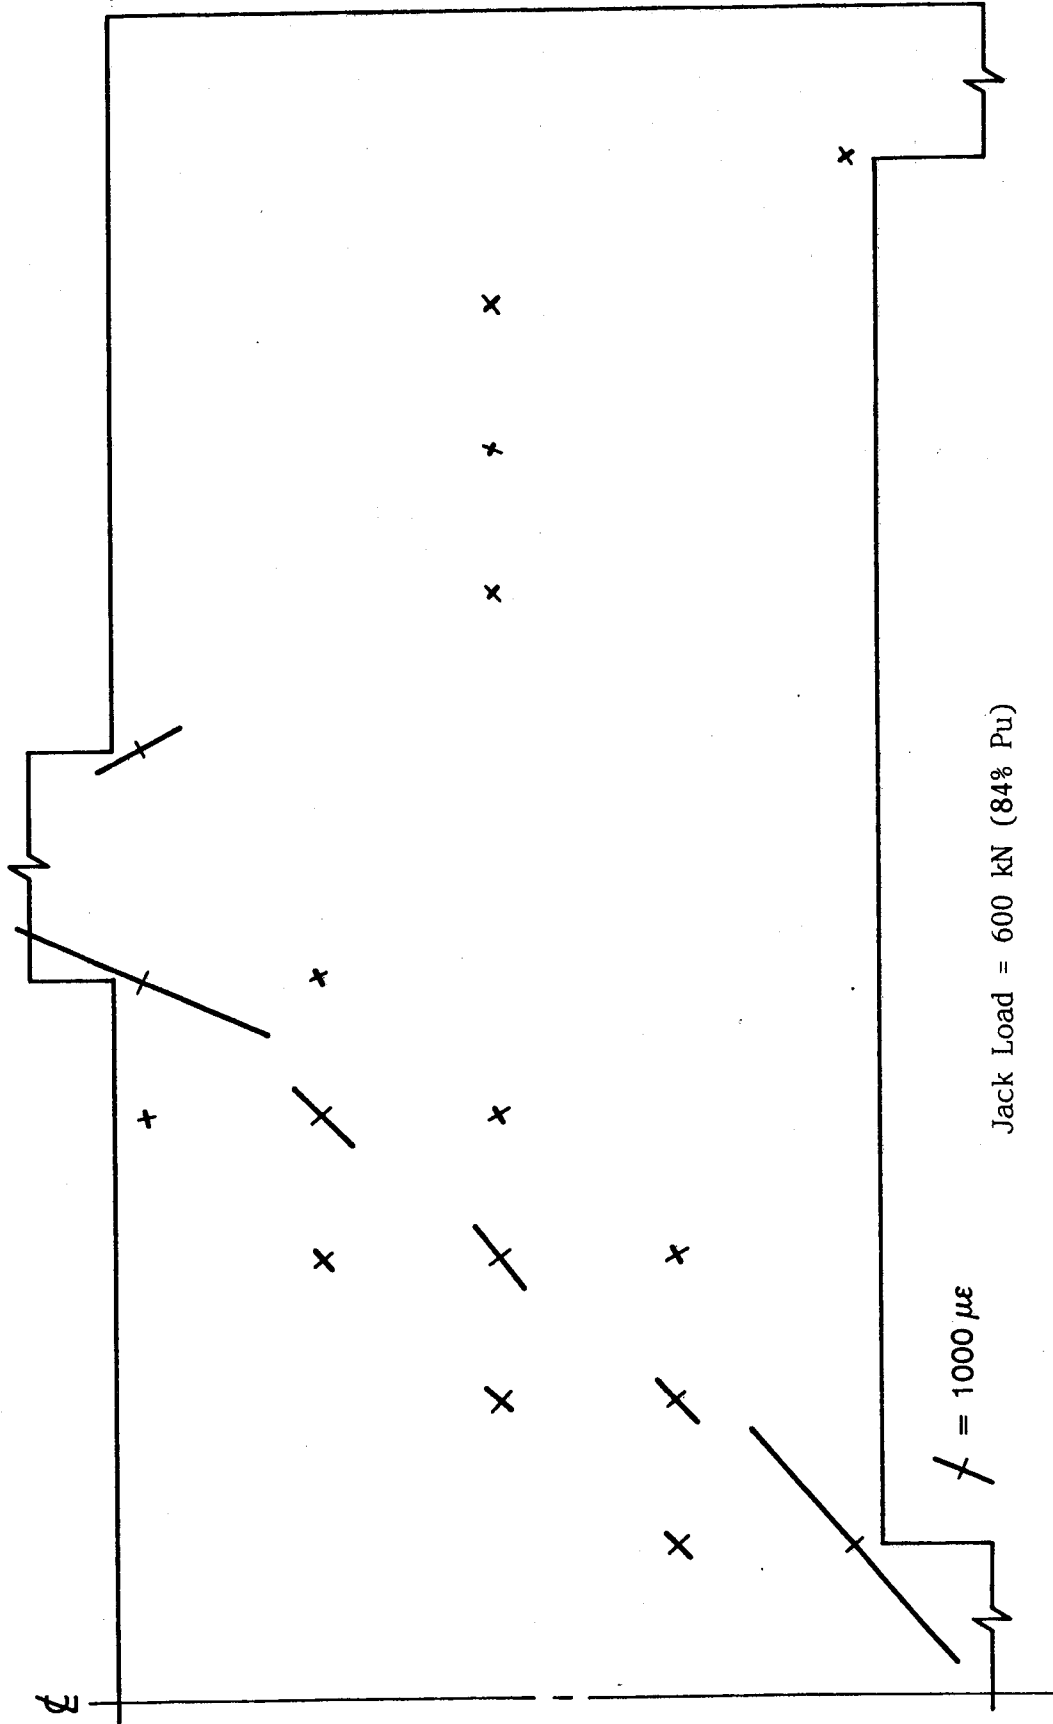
Beam 7/1.0 Concrete Compressive Strains
